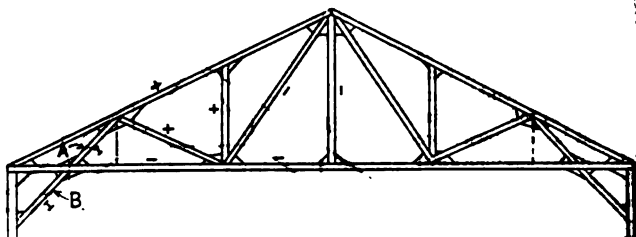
Fan Truss with Knee-braces. Spans from Forty to Sixty Feet
